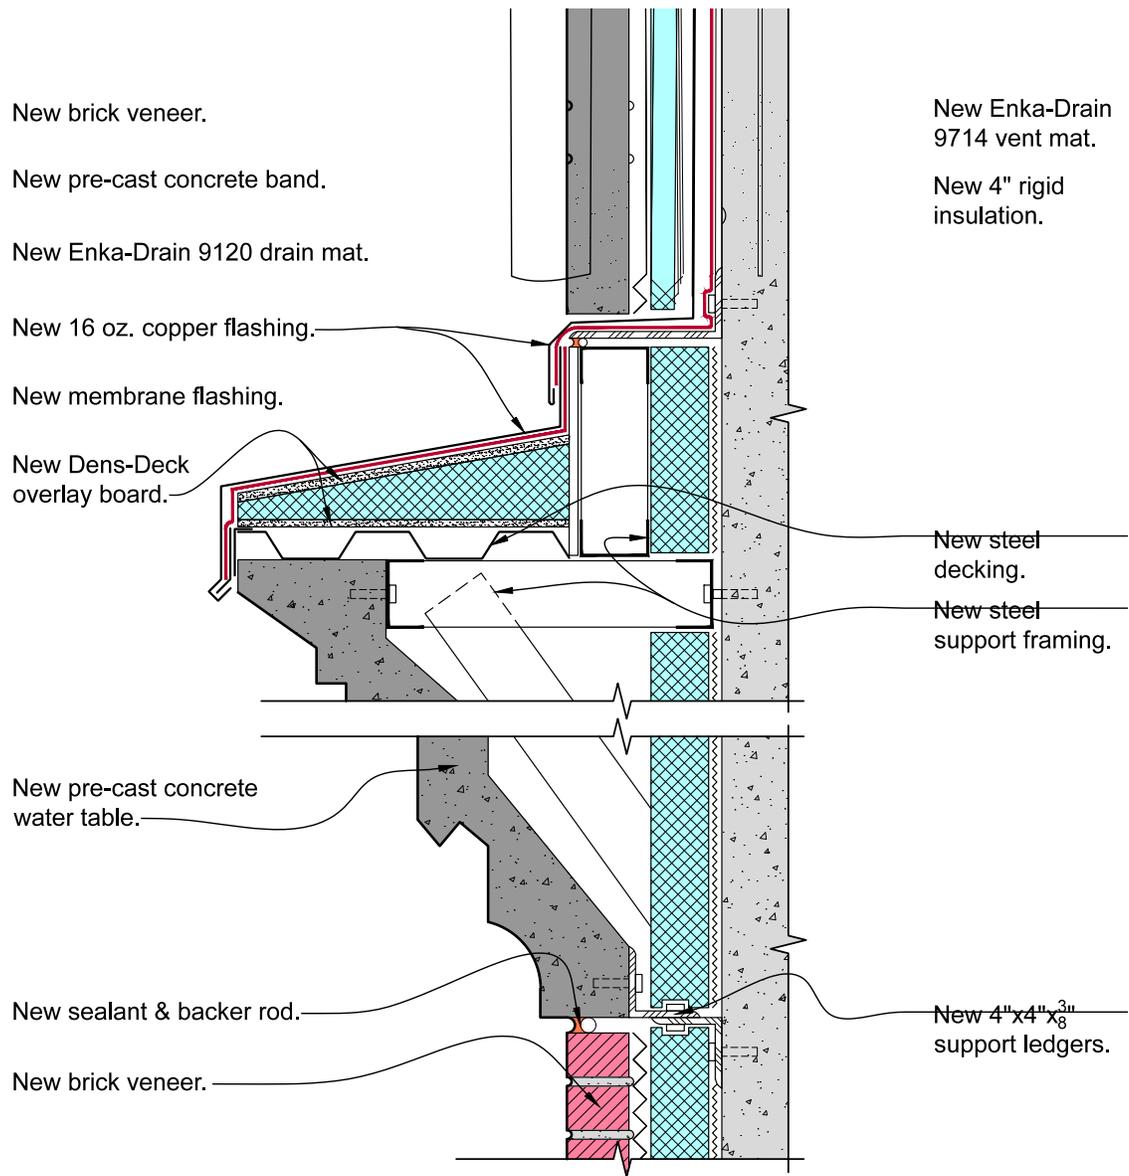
(9): Option 2 New Masonry Veneer Appr. at Level 2 Stone Water Table
